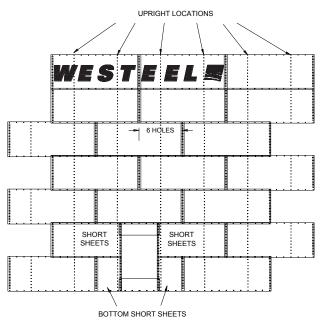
Stencil and Short Sheet Placement — Even Tiered Bins
